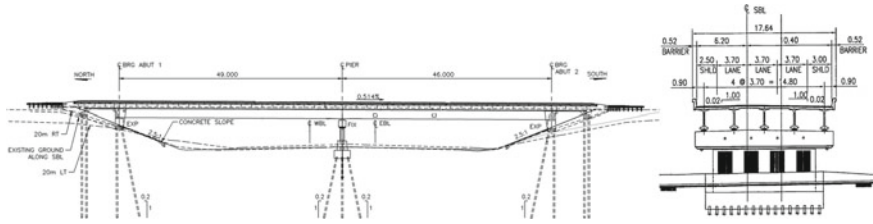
Existing bridge Elevation (left) and section (right), (Alberta ministry of transportation)
